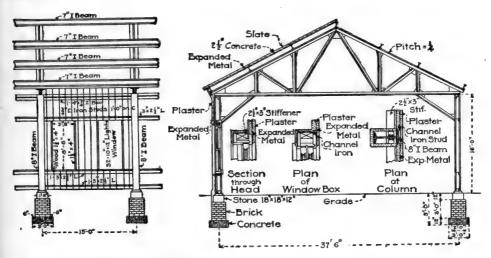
STEEL FRAME BUILDING WITH PLASTER WALLS.
